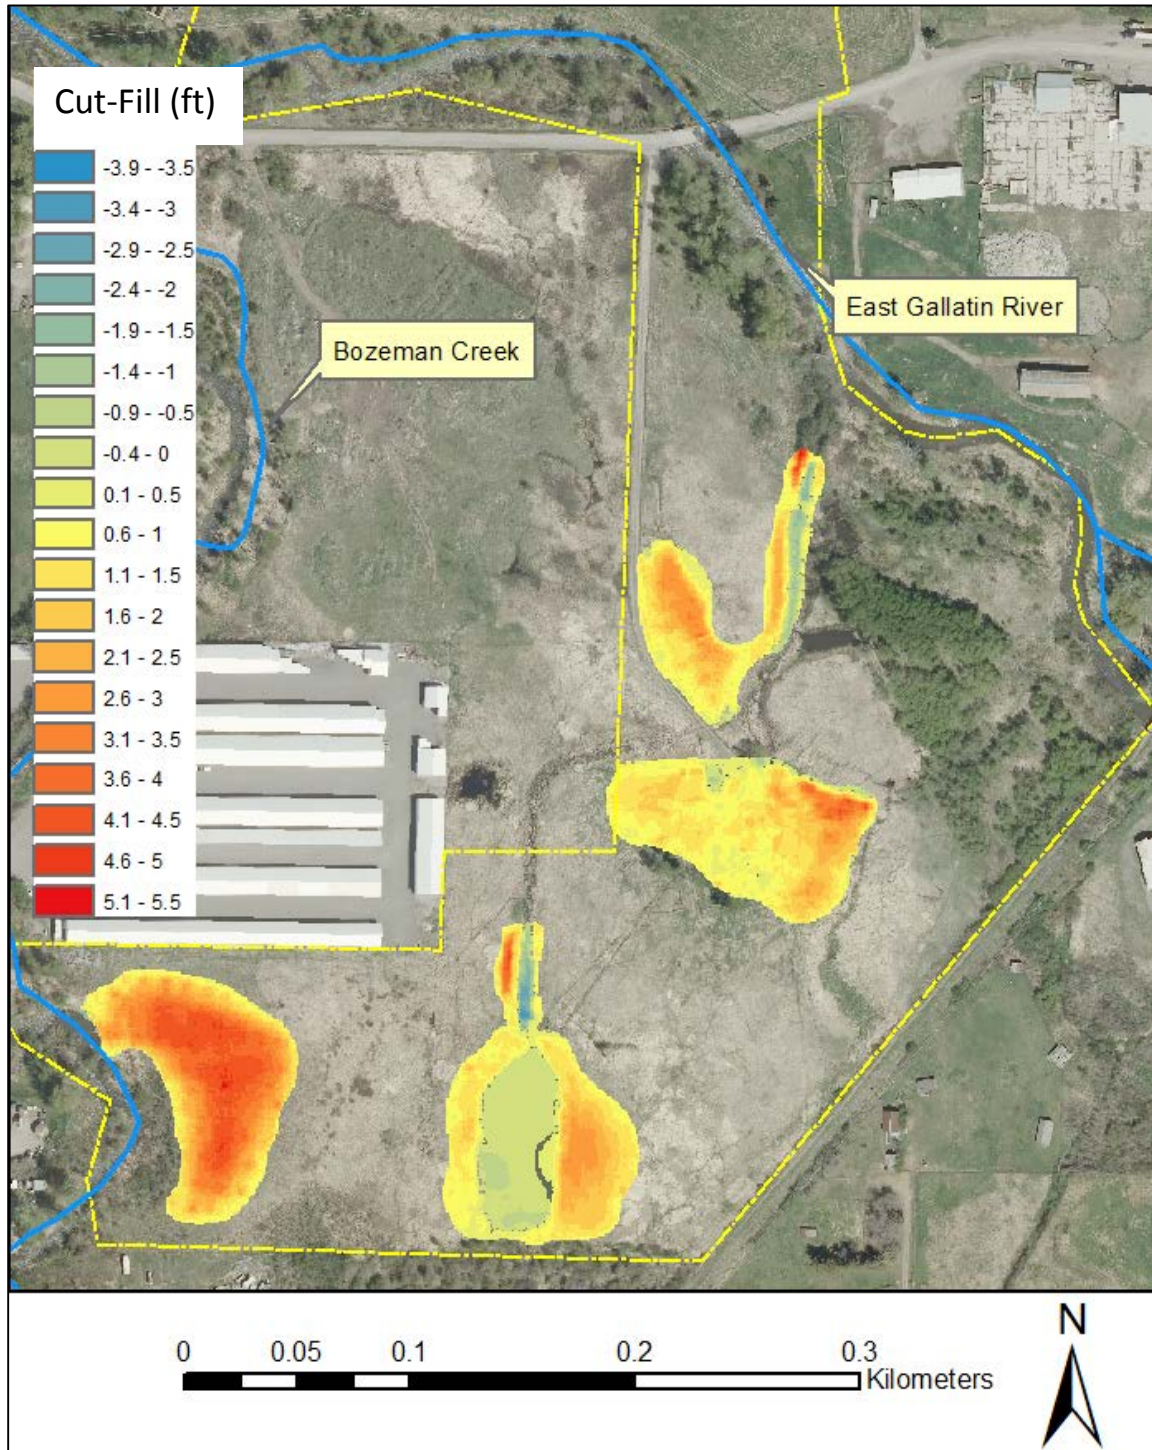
An aerial view of the Southern Parcel of the Story Mill wetland, indicating as-built excavation and fill around the pond, ditch, old structures, and in the floodplain.
